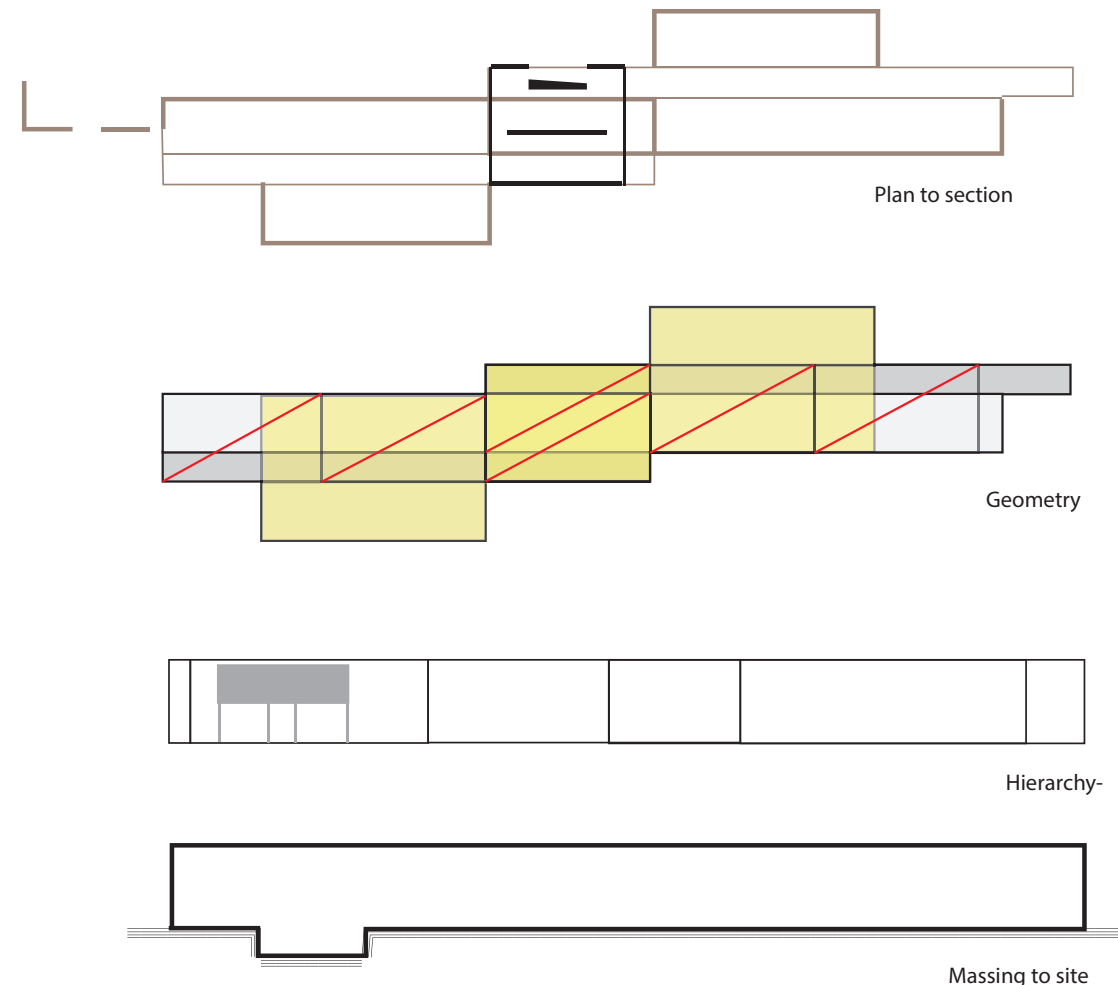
Moller Institute Plan to Section, Geometry, Hierarchy, Massing to Site Diagram
